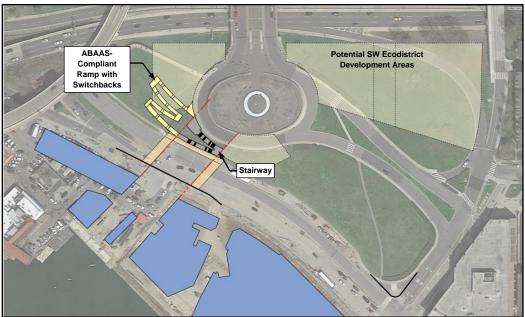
Dismissed Alternative: Stairway & Ramp with Switchbacks
